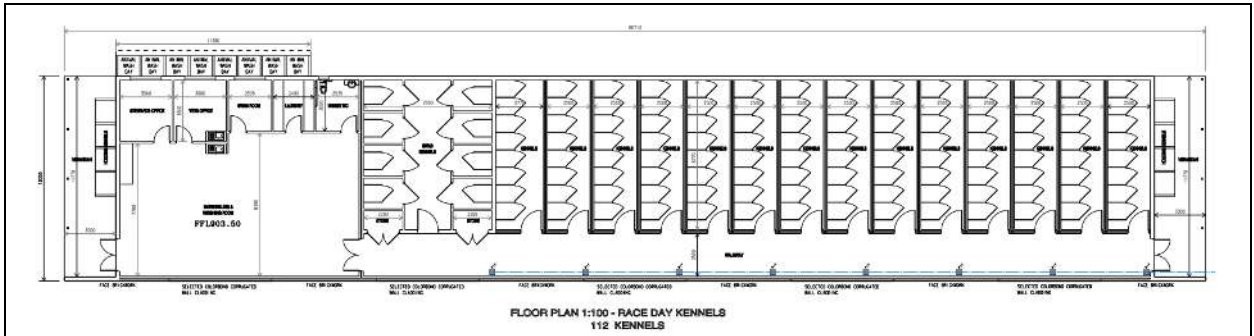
floor plan of race day kennels – 112 kennels and associated rooms
